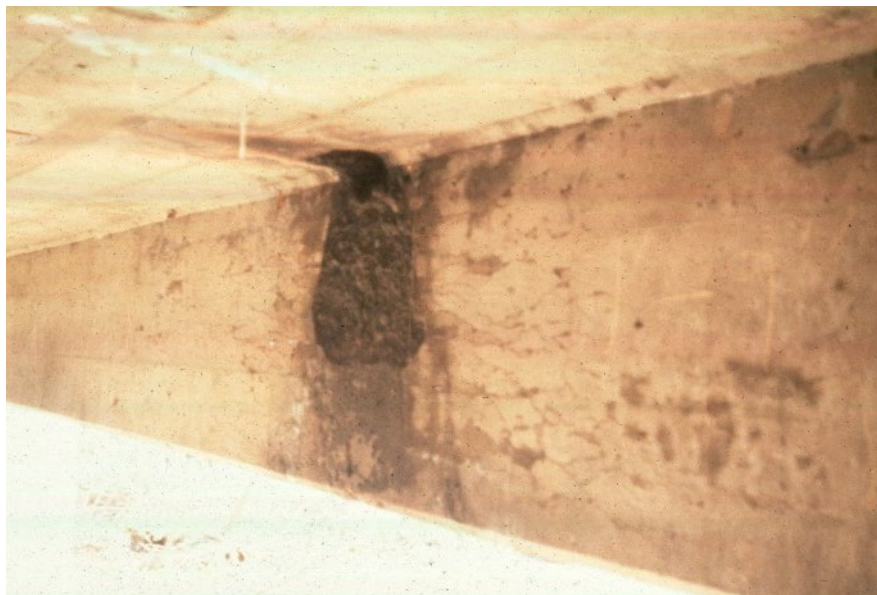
Deteriorated Tee Beam Stem Adjacent to Drain Hole
